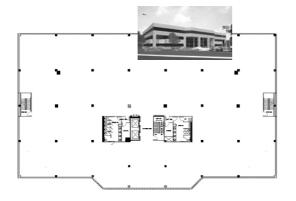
A three open-plan office building with one area of fire origin in each floor
